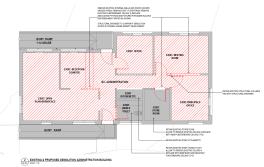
Extract of proposed demolitions to the existing administration building dated 22/03/2023
